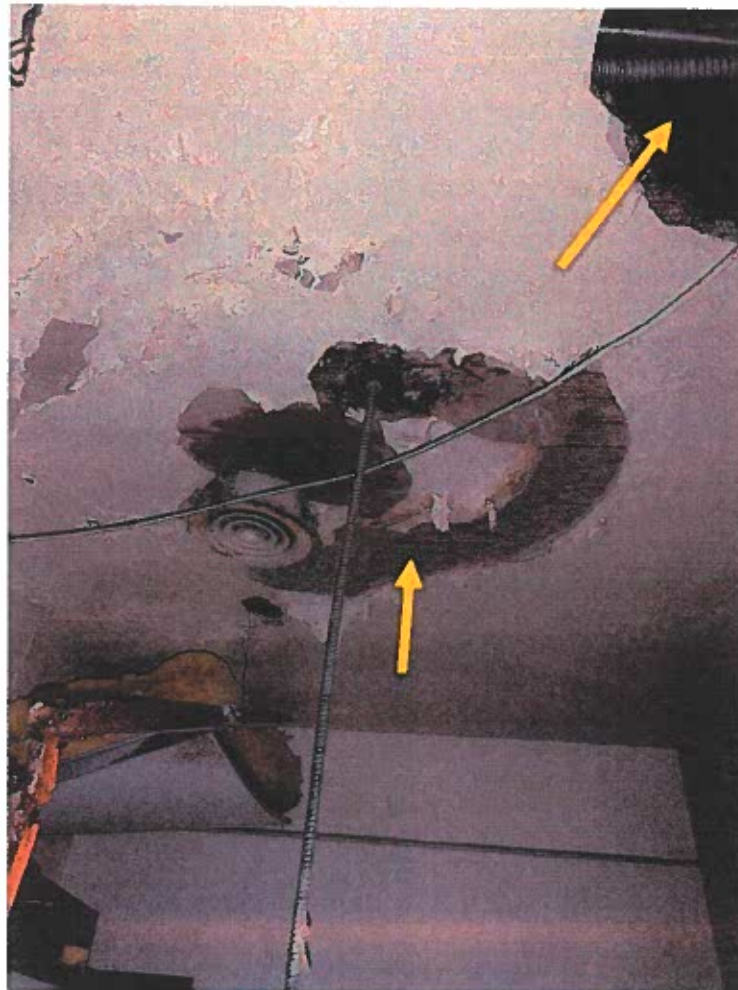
Interior side of an exterior wall. A close-up view of moisture stains and efflorescent salts (black arrows) were observed at several locations within the building due to roof damage and/or improper or damaged waterproofing at the roof perimeter and framed window openings. Flooring damage (red arrows) at the base of walls was observed adjacent to many of the exterior CMU walls. Gypsum wallboard moisture damage (yellow arrows).
